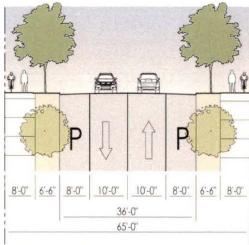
EXHIBIT L - DEPICTION OF SUBDIVISION STREET SECTIONS
